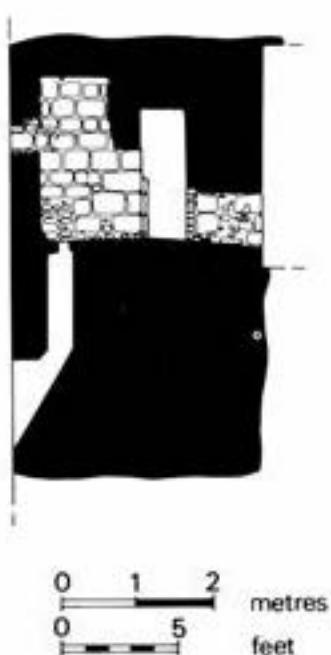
Section through the west wall showing the garderobe (room 20) and the chute through the wall
